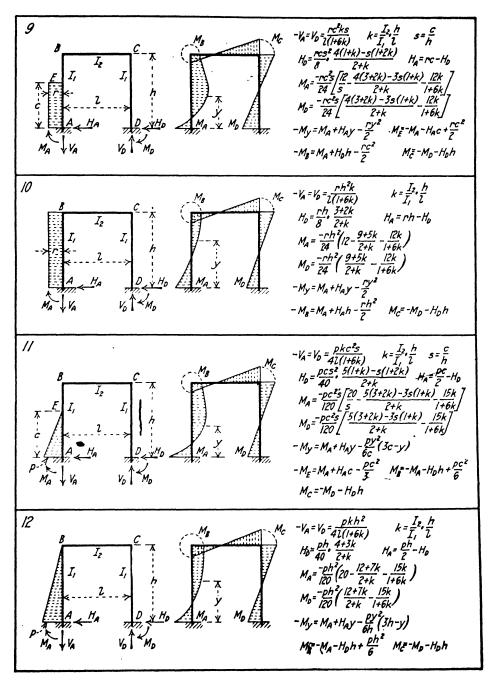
STRESSES IN STIFF FRAMES WITH FIXED COLUMNS.
